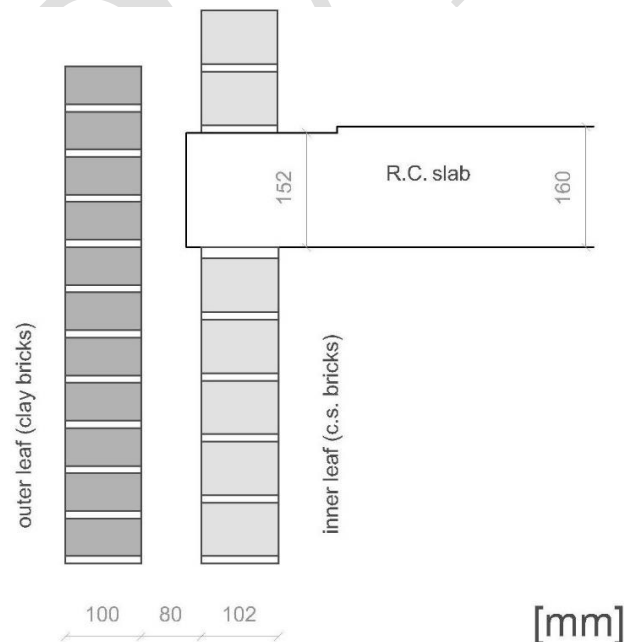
Detail of the connection between the r.c. slab of the first and second floor and the inner leaf (c.s. walls) - South side
